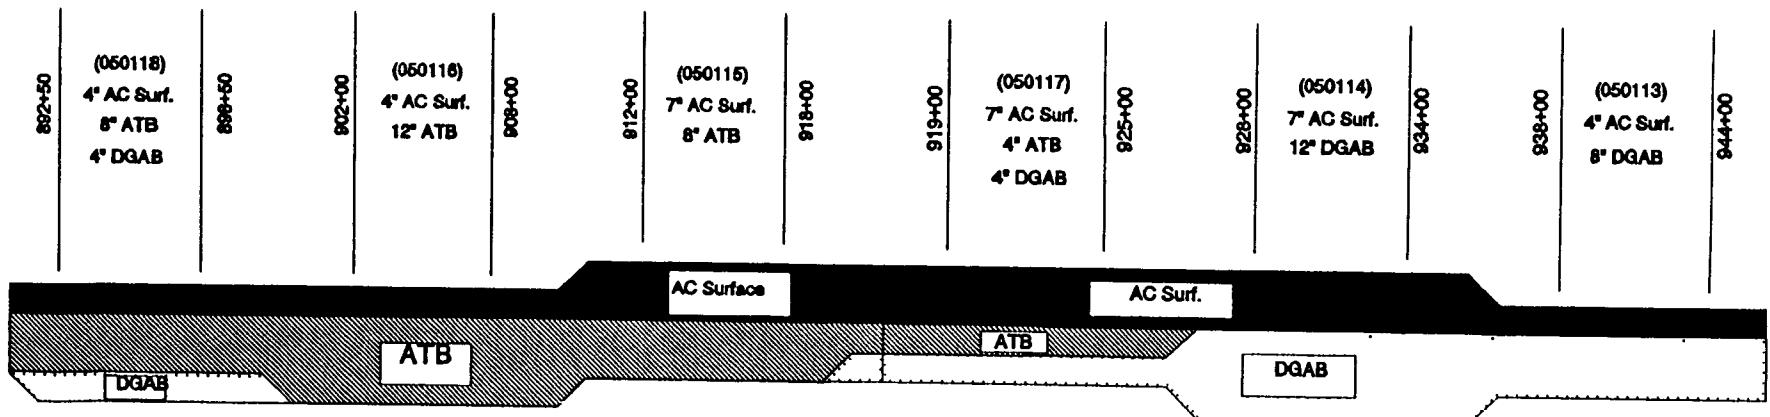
LAYOUT OF TEST SECTIONS WITH DRAINAGE
